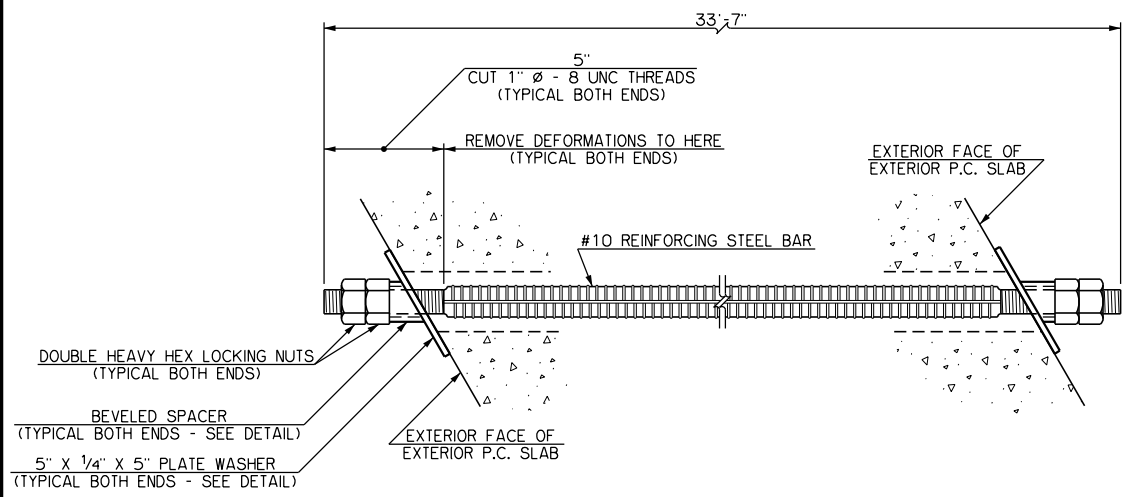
DETAIL OF TIE ROD ASSEMBLY AT SLAB SPANS SKEWED 0°
